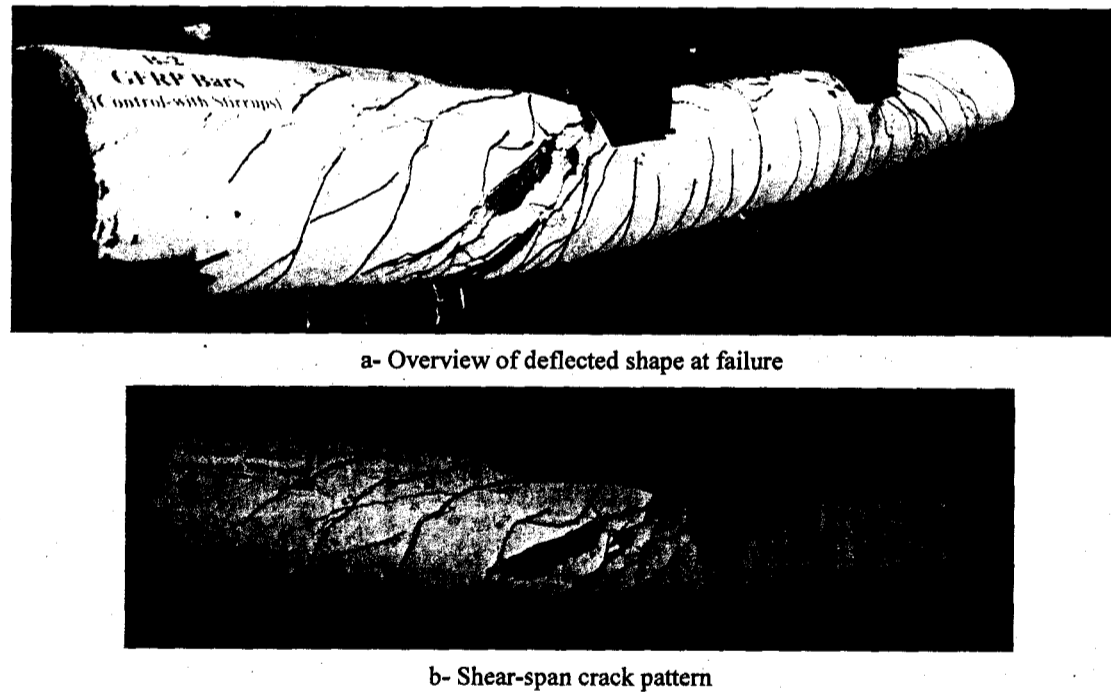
Failure mode and concrete crack pattern of RC beam COS-G-M
